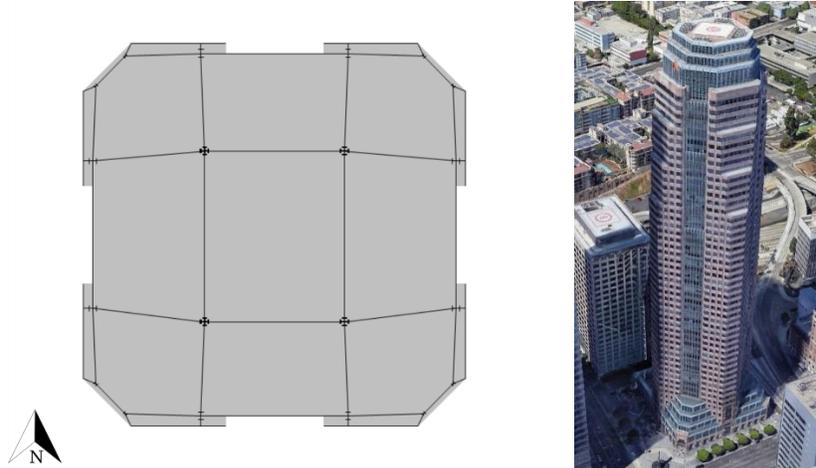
(A) Typical floor plan (floor 27) and (B) 3D image of the 52-story high-rise building in downtown Los Angeles (image from Google Earth)
